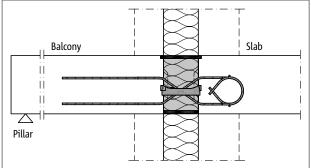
Schöck Isokorb® XT Type Q: Connection with non-load-bearing cavity masonry
